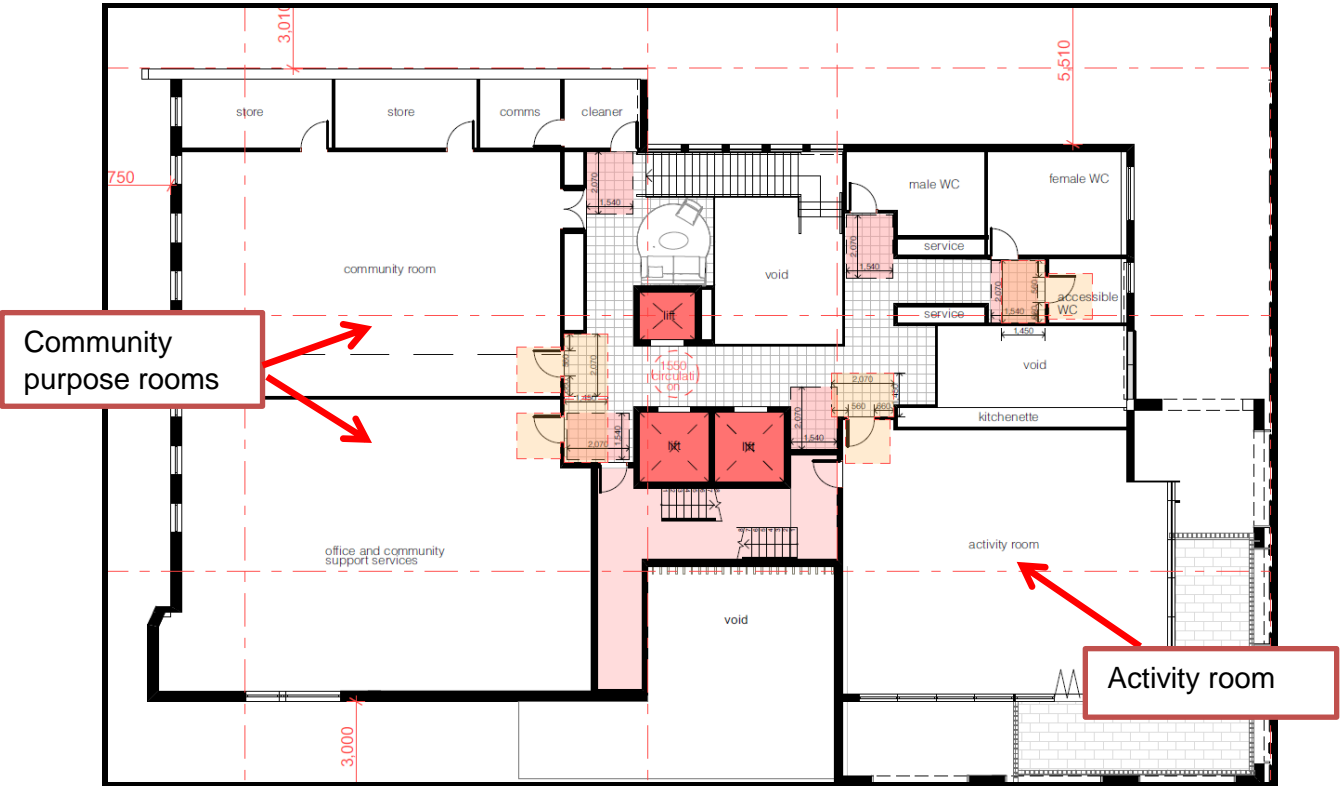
Proposed First Floor Plan (Source: Integrated Design Group, September 2020)
